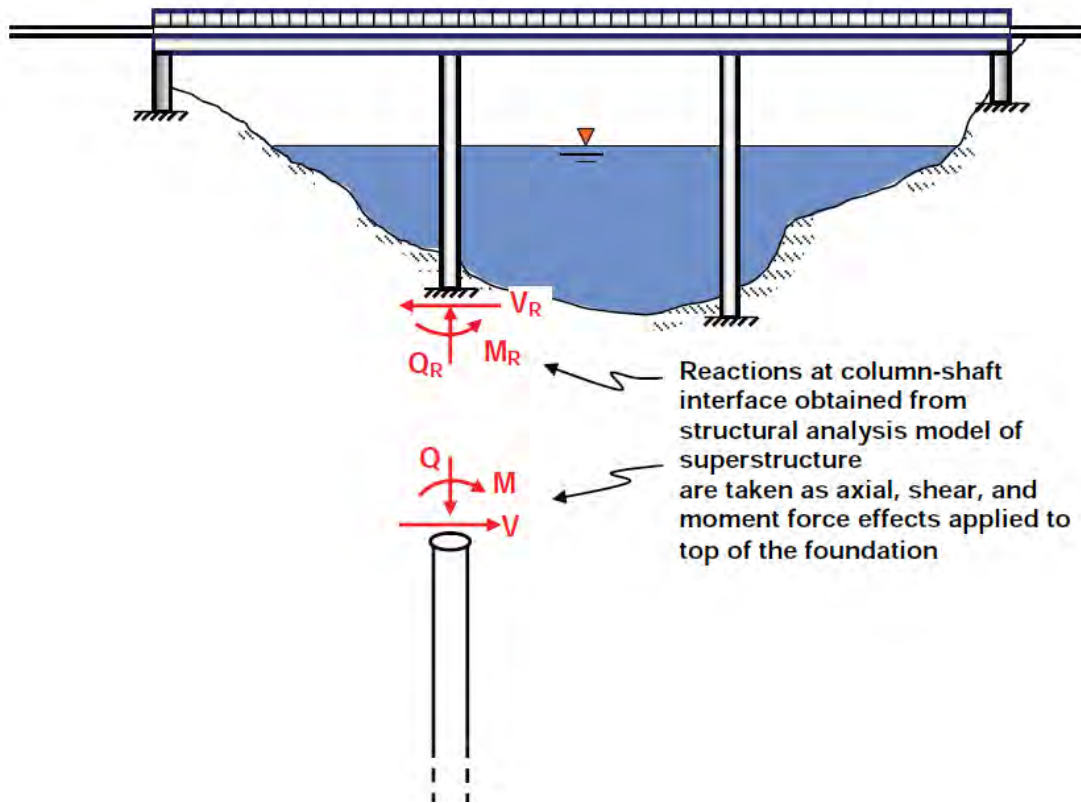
Illustration of force effects on bridge foundation (after Abu-Hejleh et al. 2011).
